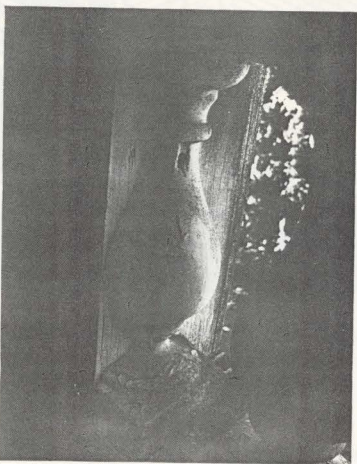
Turned Baluster of the North-Elevation Balustrade: 1988 View
